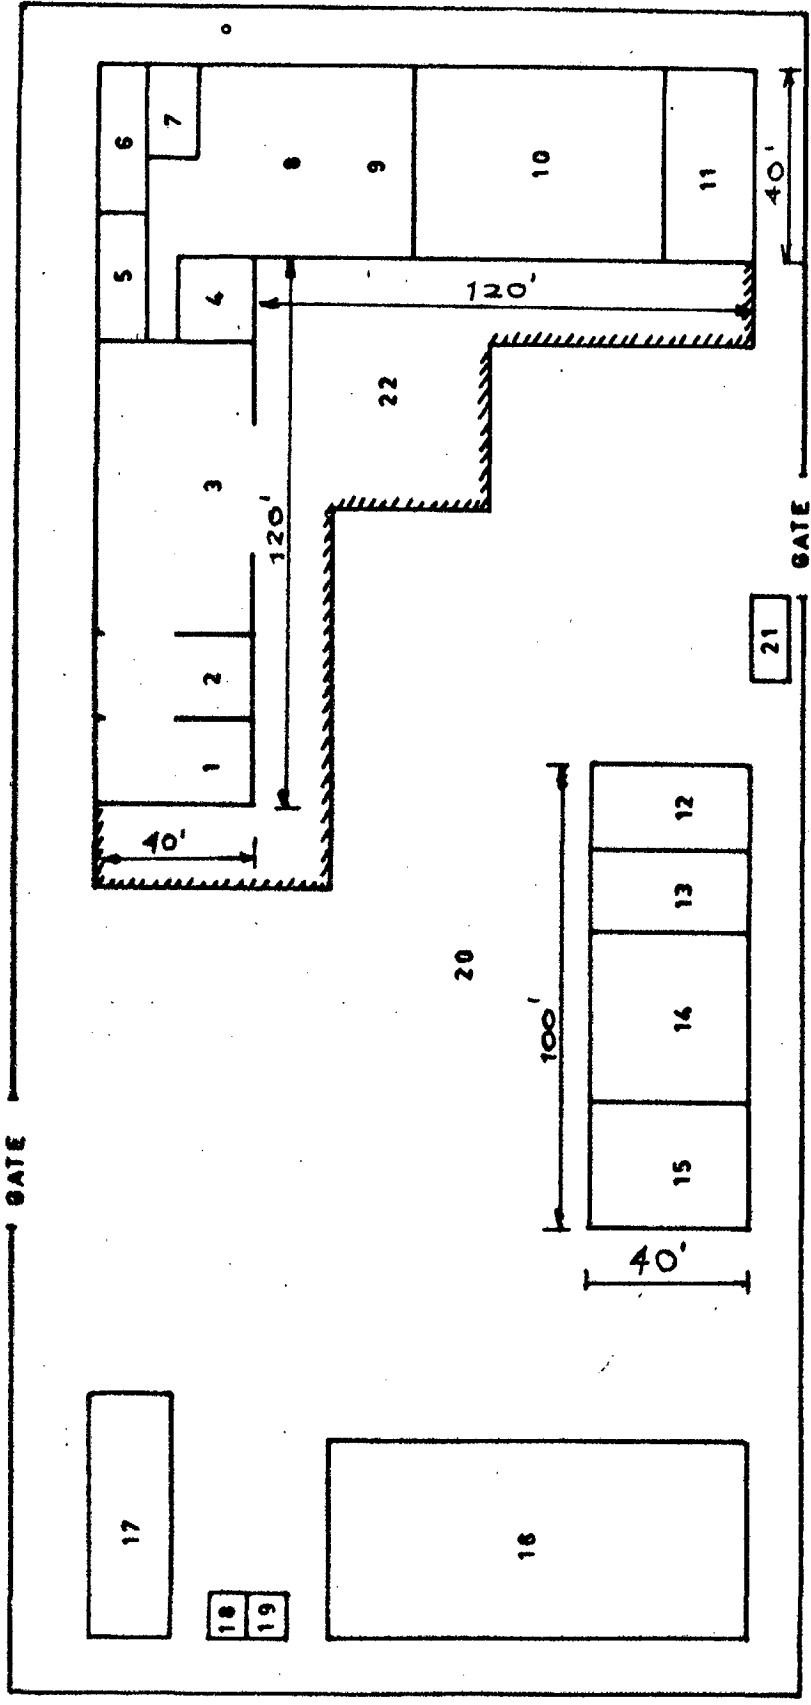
TYPICAL REPAIR SHOP LAYOUT
